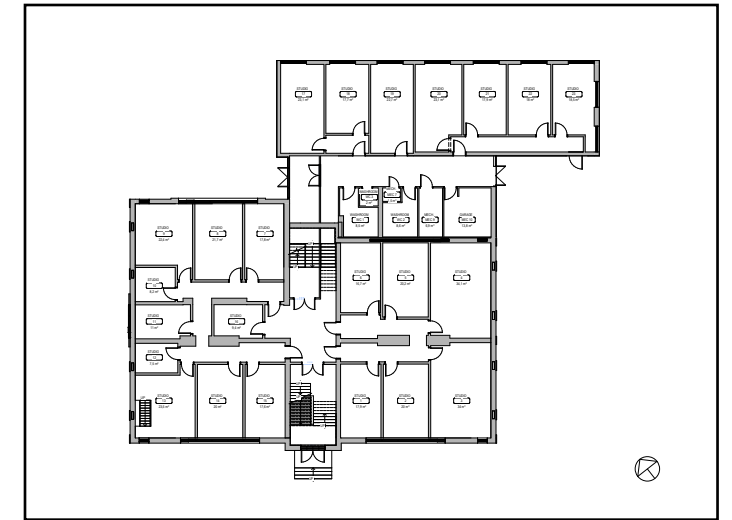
827 Gordon Street ground floor plan. Prepared by EVOQ.
